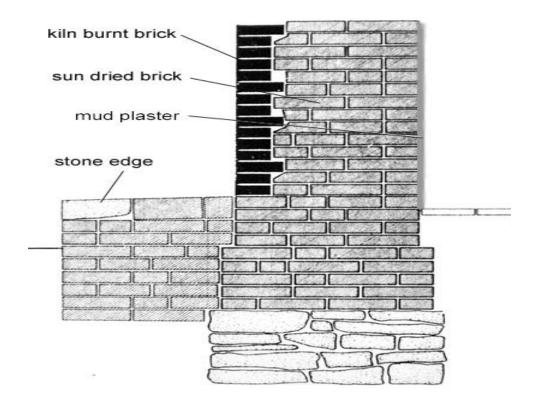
A sectional view of traditional external wall with burnt brick and sun dried brick (Source: Korn 1976)
